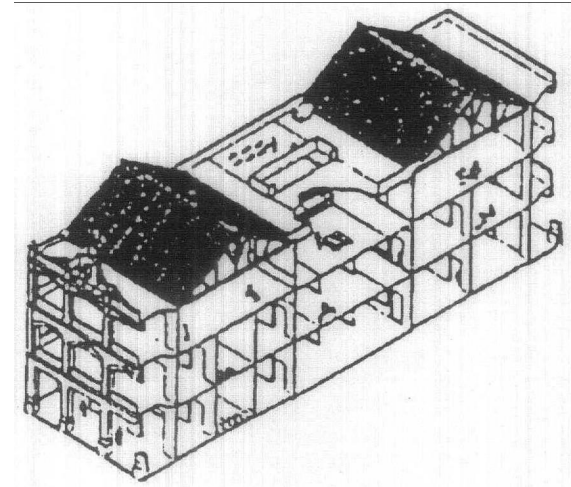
The axion section of Qilou building (Gao Haipeng, 2003)
